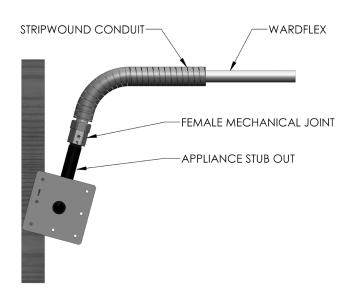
Appliance stub out with a WARDFlex®/ WARDFlex®MAX female mechanical fitting which can be installed in a concealed location. For this type of arrangement refer to section 4.4 on for protection details.
